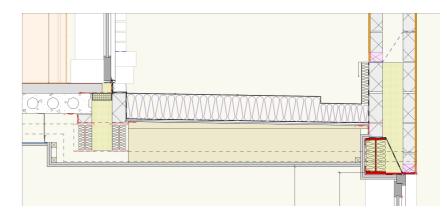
Section by West & Matchell Architects highlighting changes made to the balcony/roof deck.
